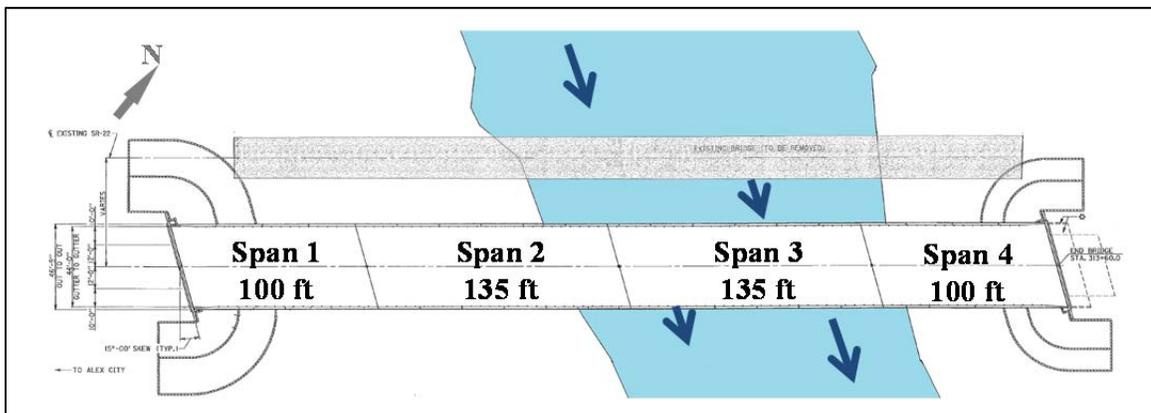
Plan view of the bridge over Hillabee Creek (Spans 1 & 2 are SCC girders)
